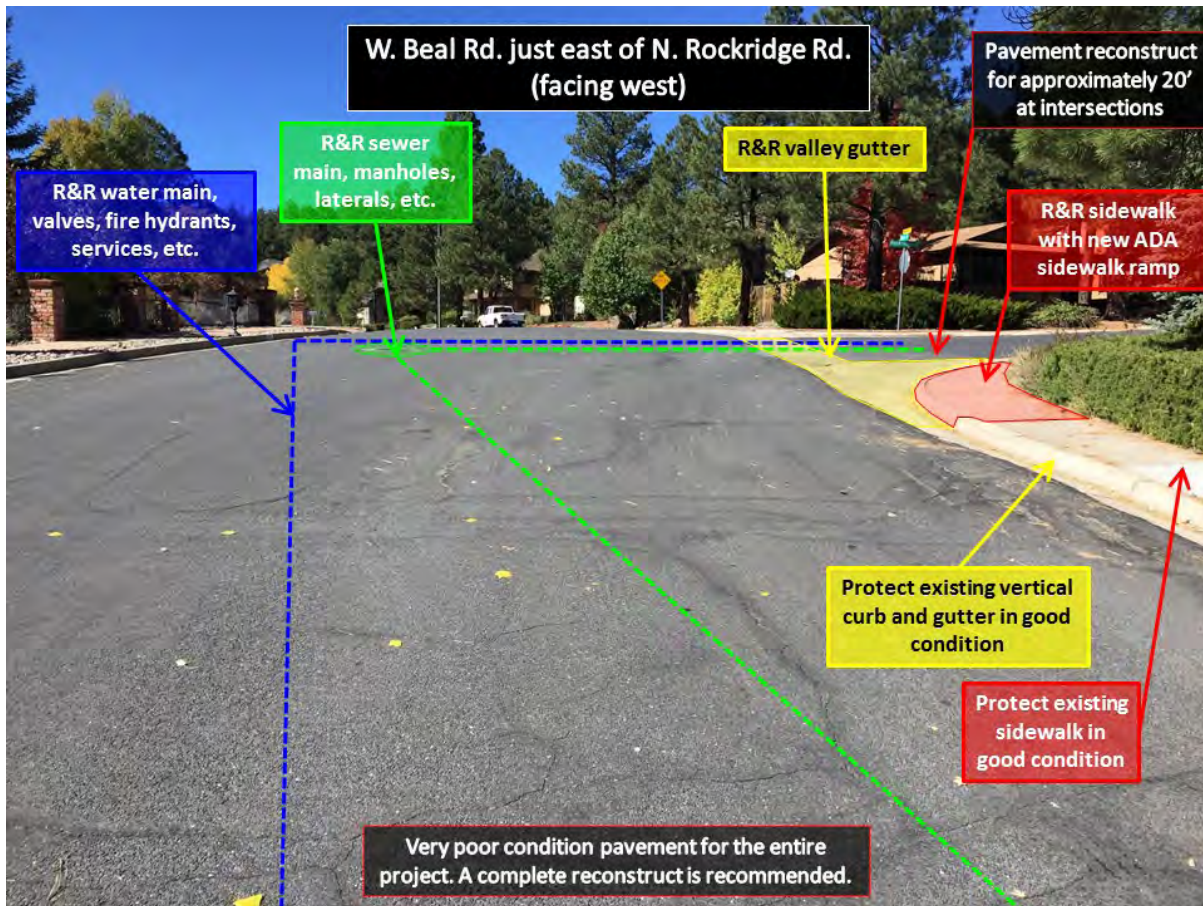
R&R water/sewer mains & appurtenances, pavement section, valley gutter, and sidewalk with ADA ramp.
